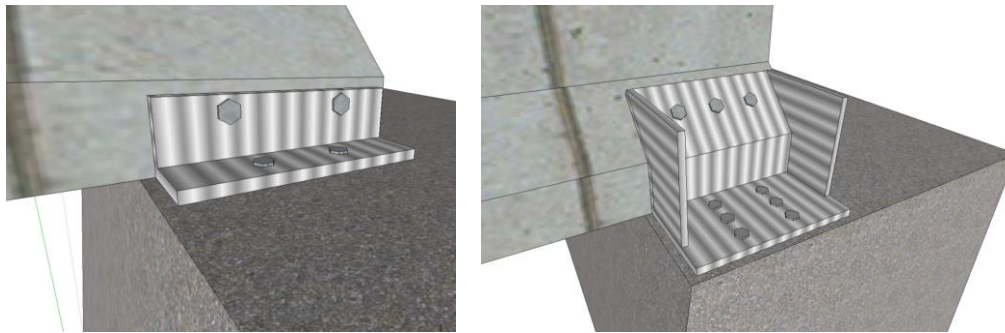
Conceptual detail of connections between the girders and bent beam: (a) current connection configuration, (b) reinforced connection to carry both lateral and uplift forces.
